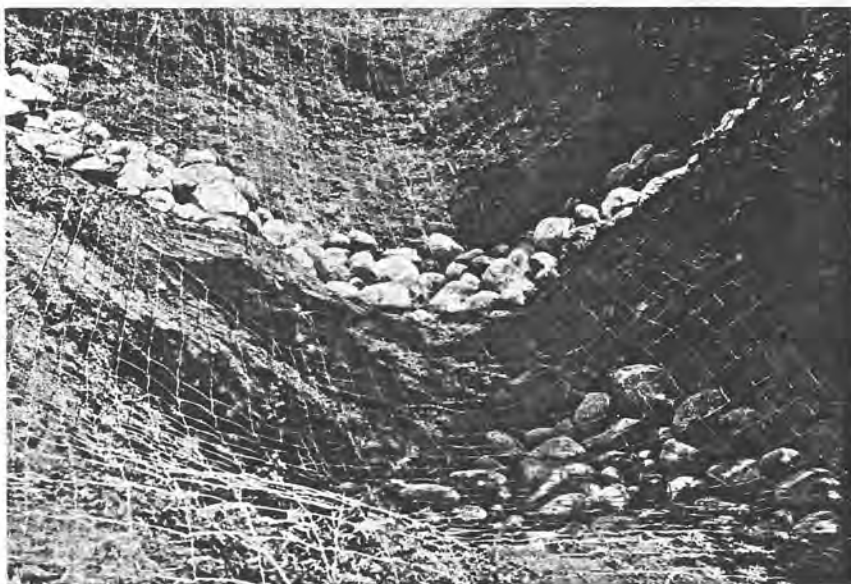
Upstream view of a construction site for a wire-bound dam. Note that key and apron excavations were filled with rock before wire mesh was placed on the bed banks. The site is prepared for the construction of the dam proper.
